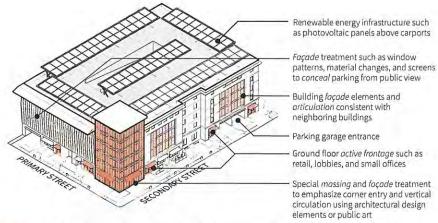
Design stand-olone parking garages with active frontages at the ground floor and articulate them to be consistent with neighboring buildings.
